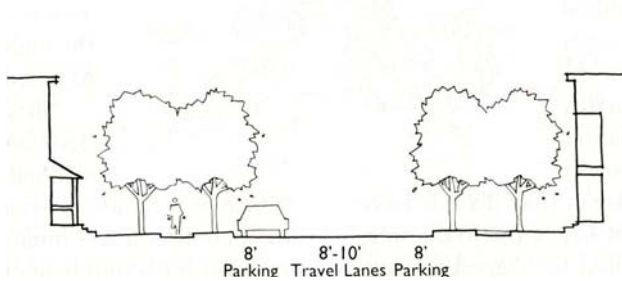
Street Width. Width of a typical street. (Calthorpe 1993, 95).
